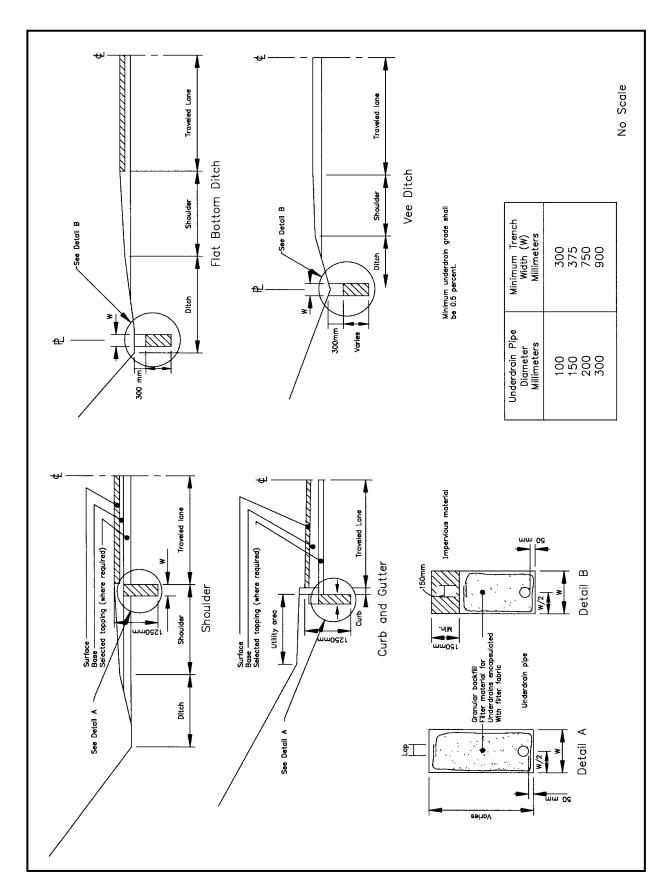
J TYPICAL UNDERDRAIN INSTALLATION FOR ROADBEDS AND DITCHES (Metric)
